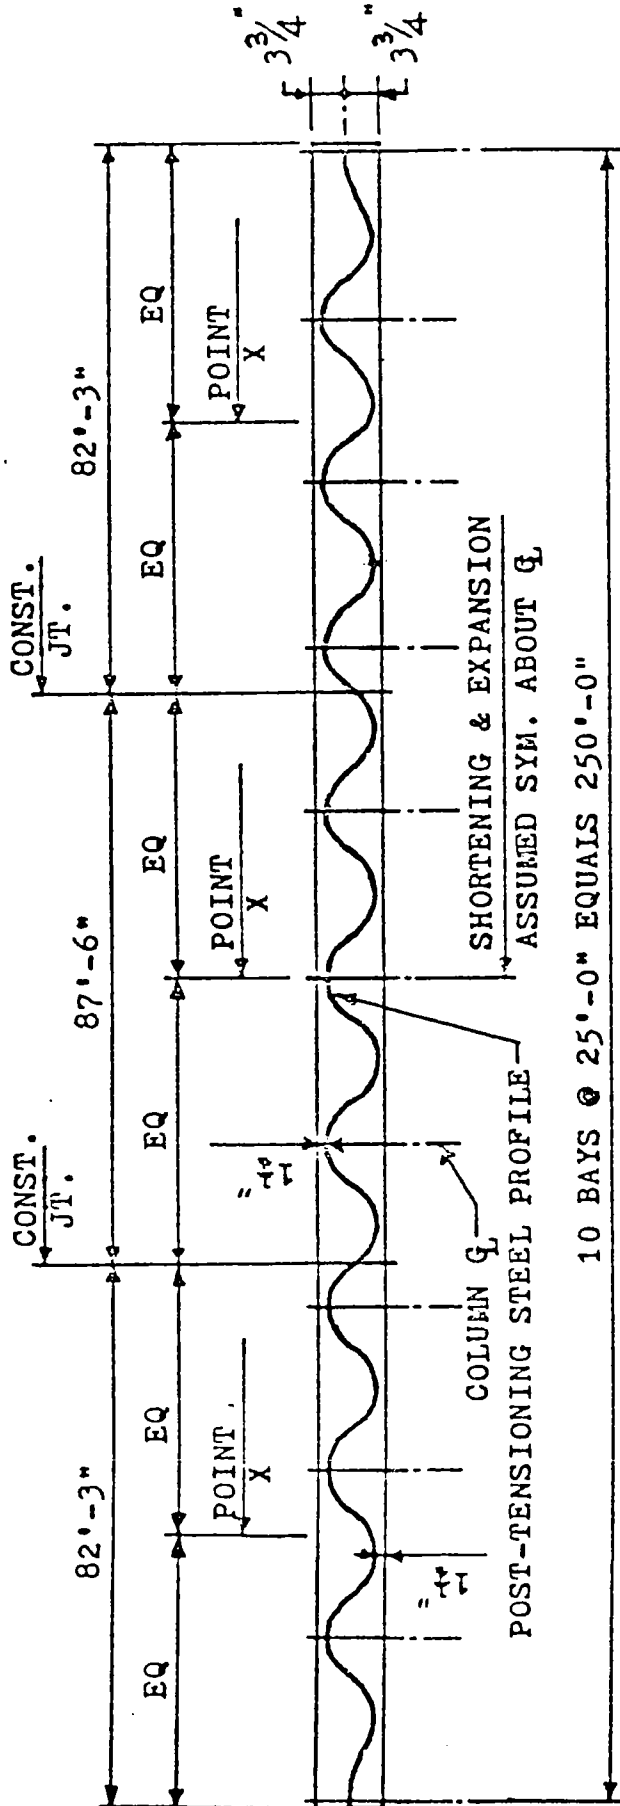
EAST-WEST CROSS SECTION THROUGH FLOOR SLAB
